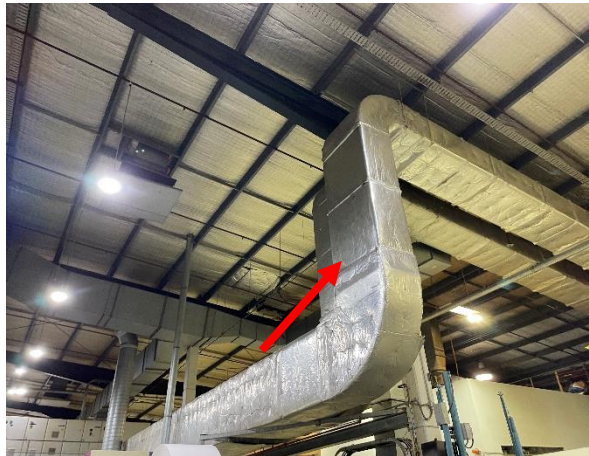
Main Warehouse – assumed SMF insulation to air conditioning ducting
